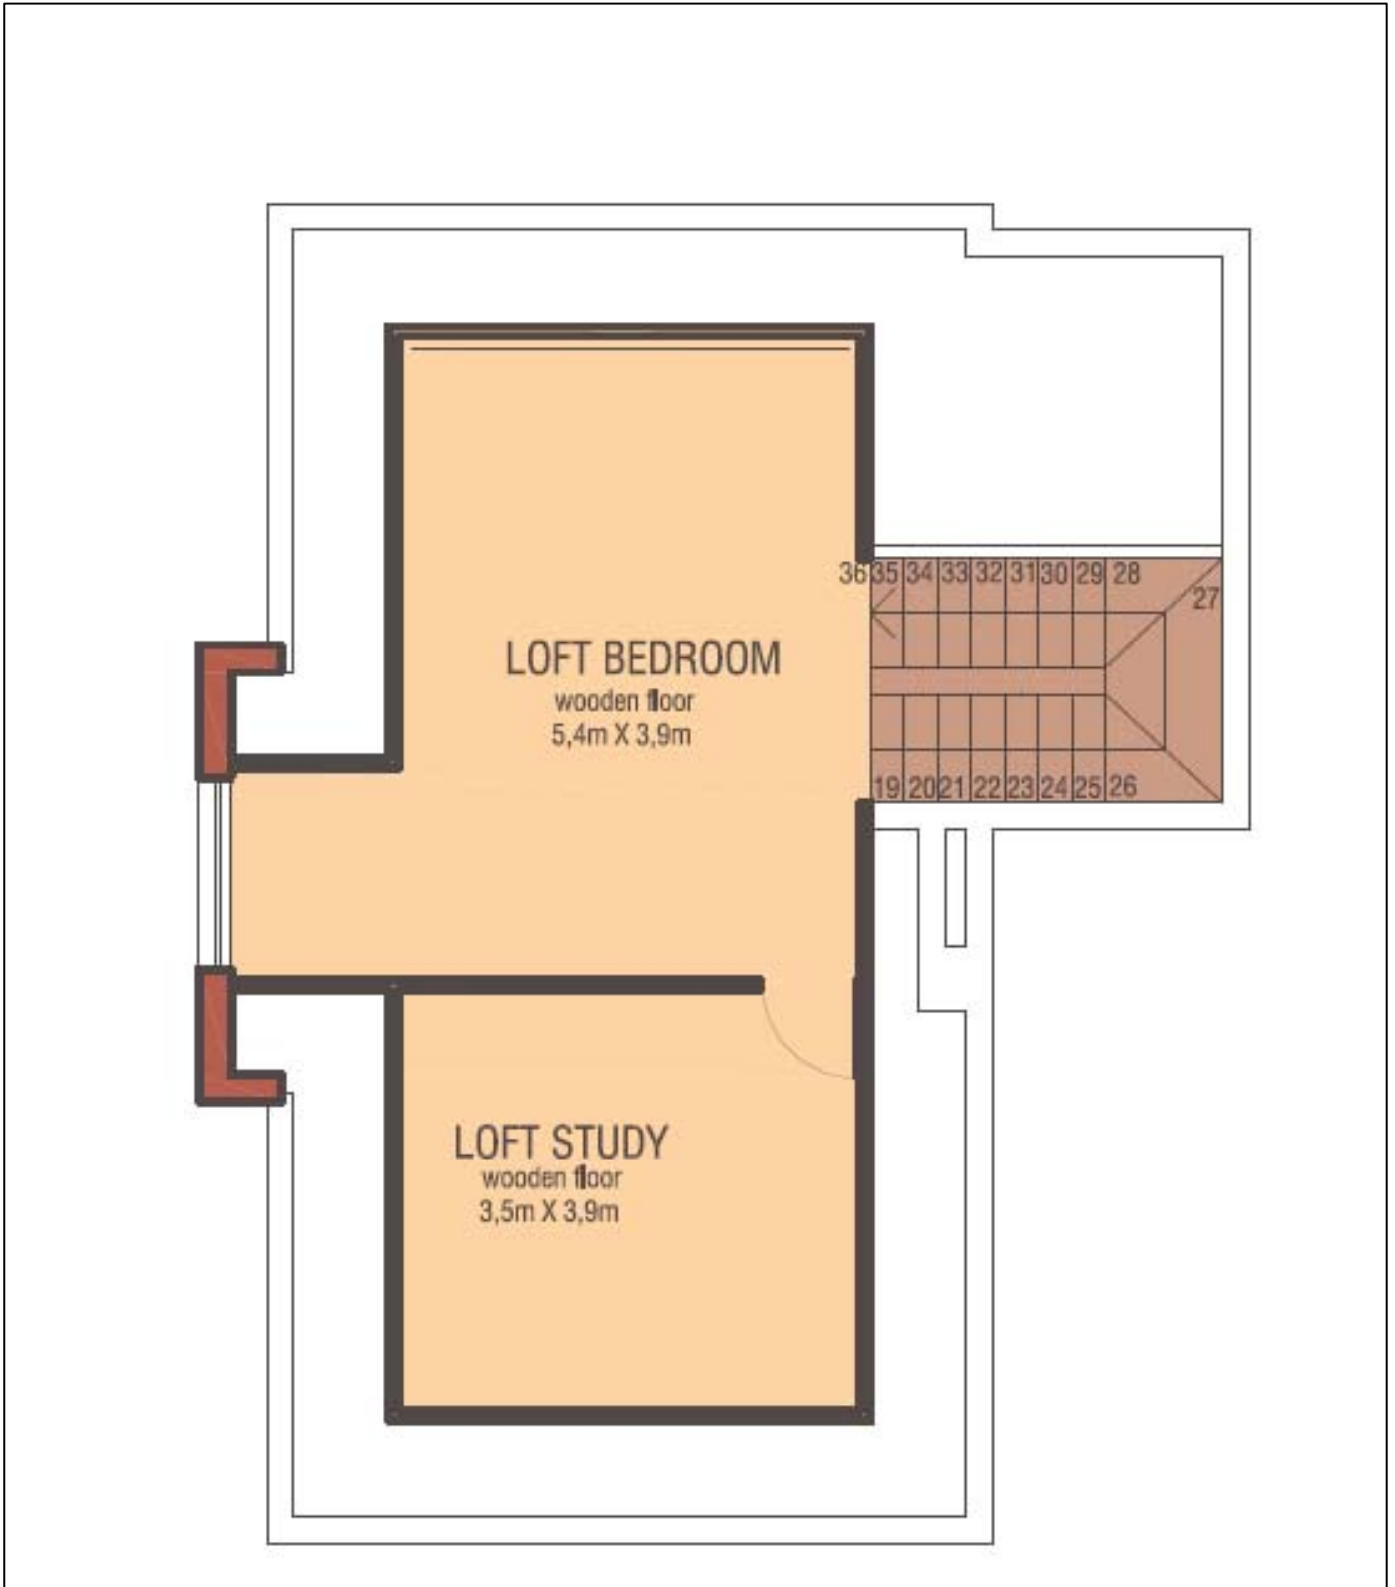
Layout of type-D loft floor (Arlington representation, 2008)
